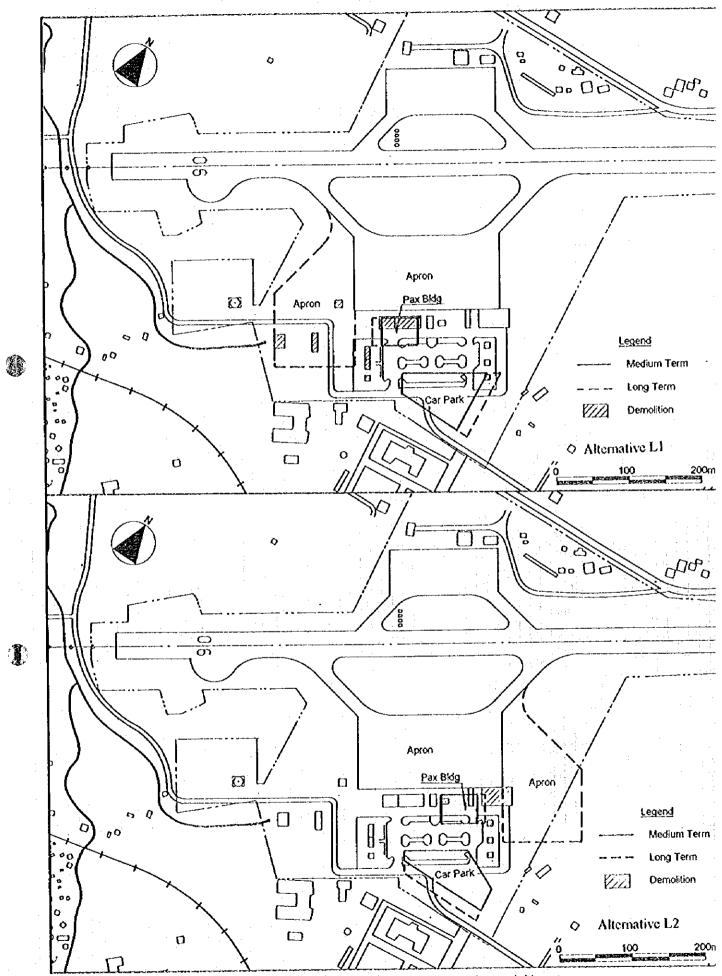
Alternative Layout of Terminal Area - Legaspi Airport
